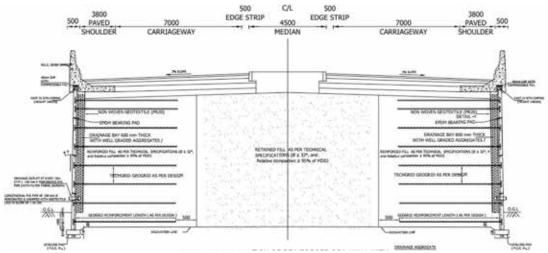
The typical cross-section of single tier RSW at Koida side up to height 15.6 m
